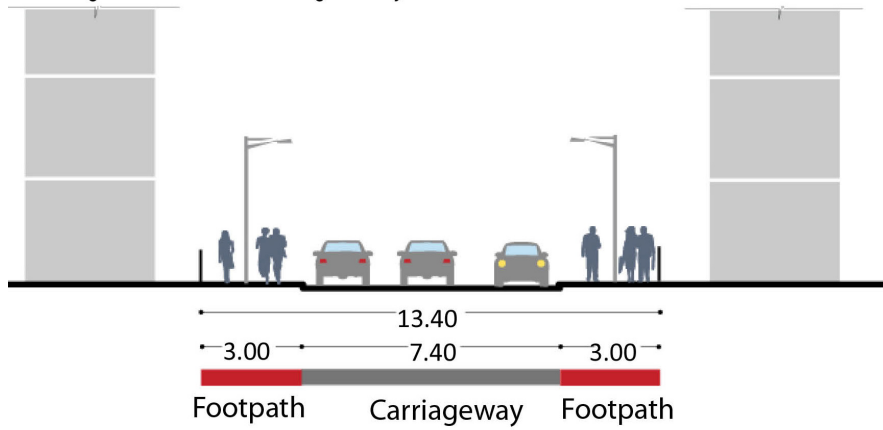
Allocation of Right of way for 18.30M Road (Alternative 1)
